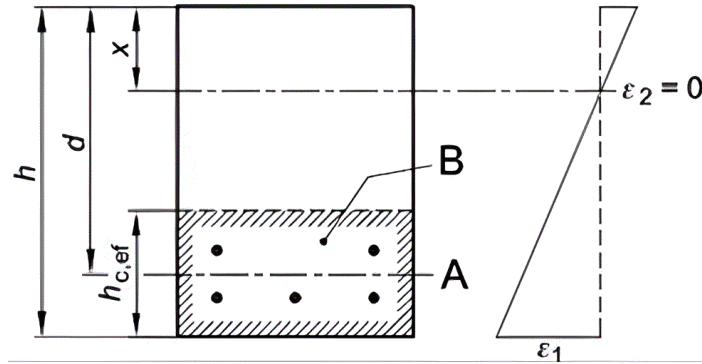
The definition of $h_{c,eff}$ for reinforced concrete beams with a rectangular cross-section [5]
